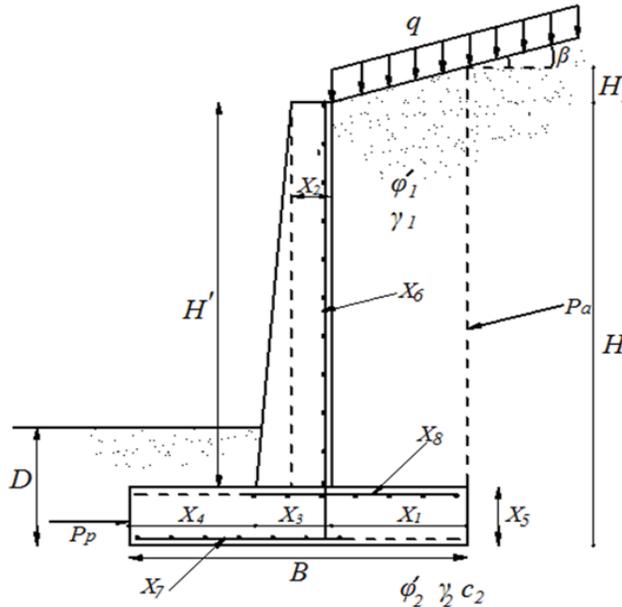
Cross section of the RCC retaining wall. The figure is modified.
